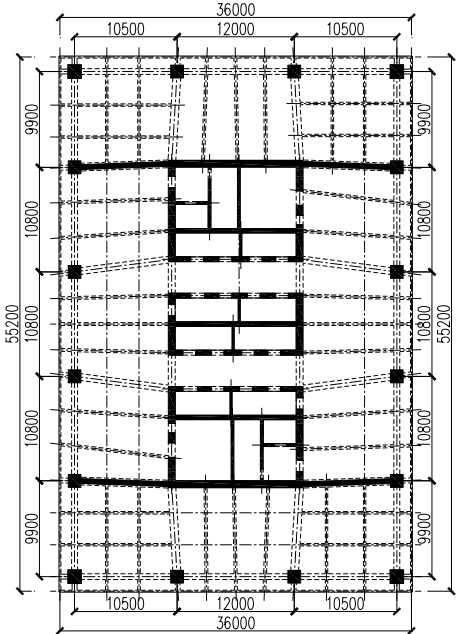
Typical plan layout of structure (bold dash line represents outriggers members)
